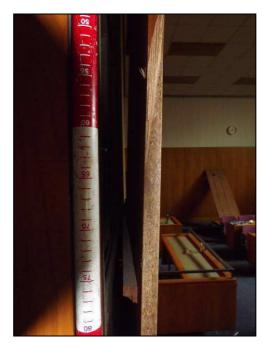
Detail of chipboard panelling with veneer covering, Third Floor
